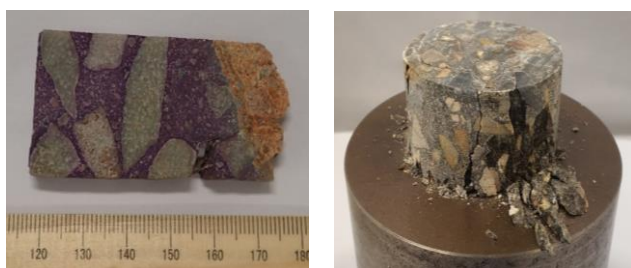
Concrete specimen showing partial corrosion (left) and strength testing of concrete (right)
